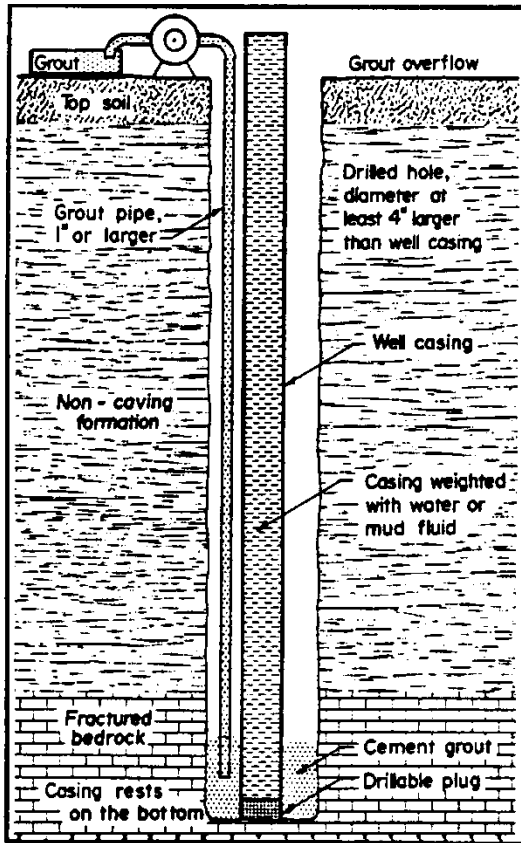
Grout Installation by Positive Placement Exterior Method. Grout is pumped through a pipe lowered into the annular space outside the casing. (Johnson 1966)
